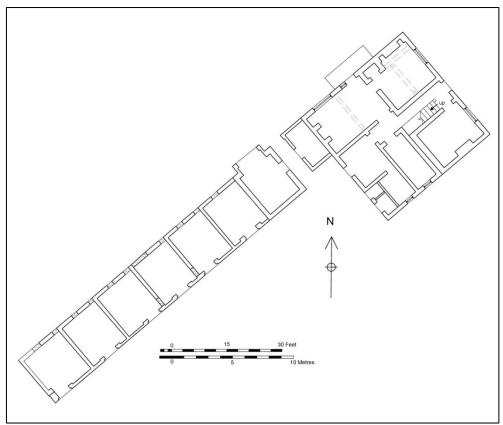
Ground floor plan of farmhouse with loose-boxes to rear.
